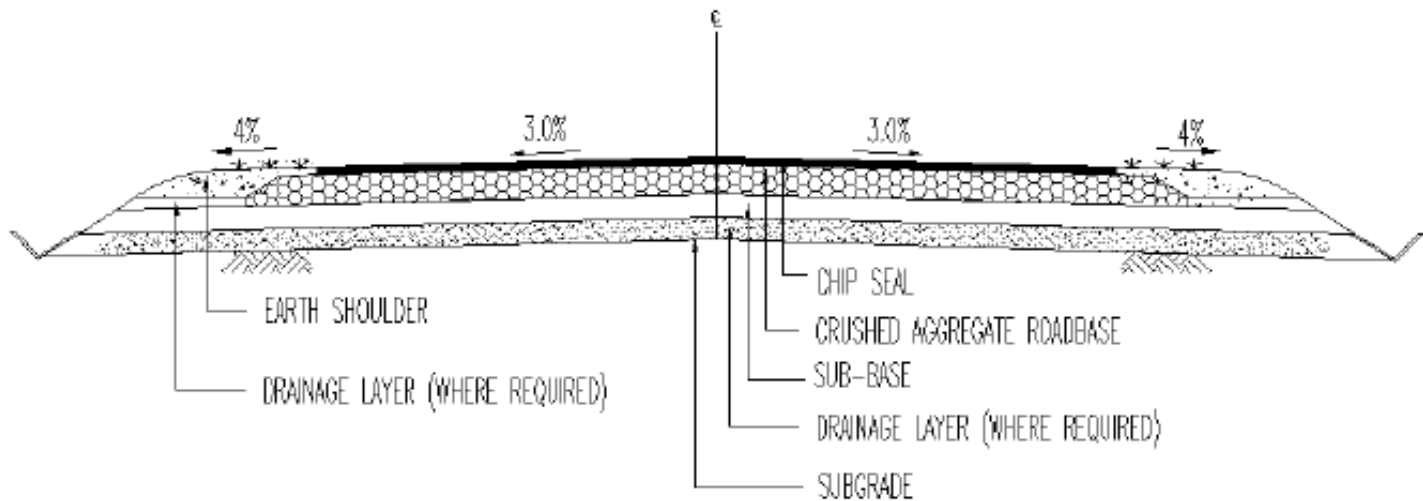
Single Carriageway – Minor (Low-Volume) Road
